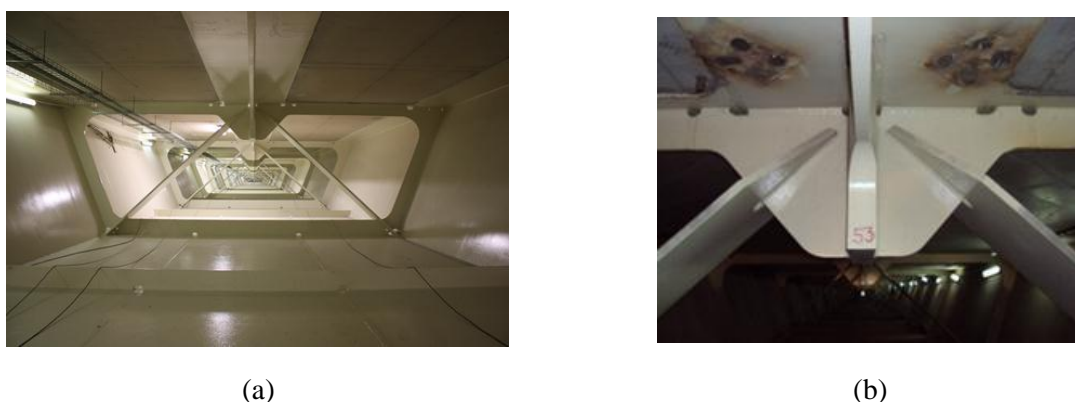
Critical detail to fatigue damage: (a) cross-section of the deck and (b) critical detail.
